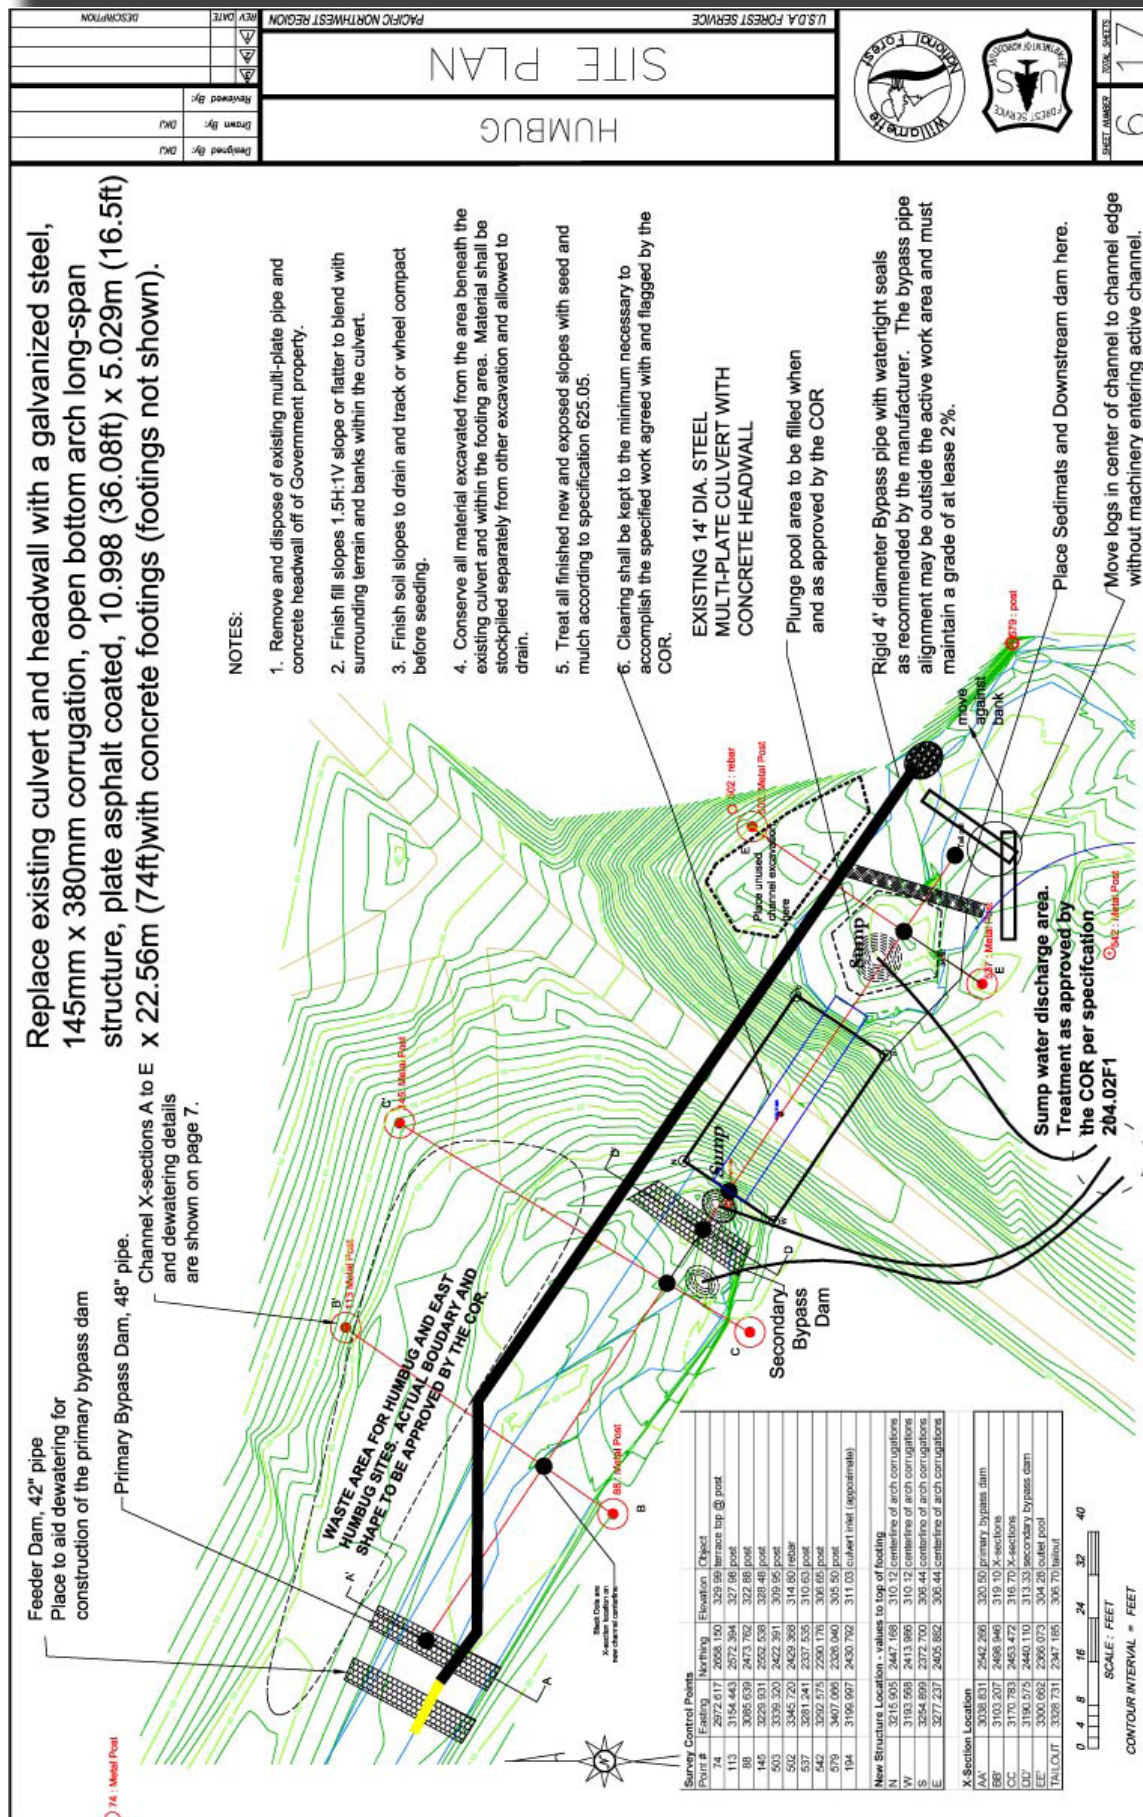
Humbug West Sheet 6 - Site Plan with Dewatering System.
